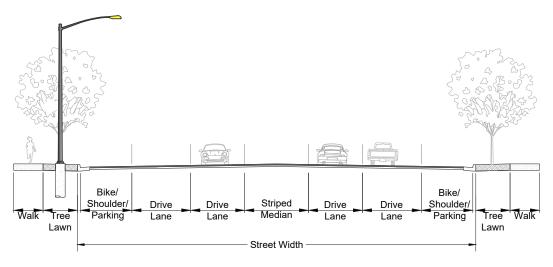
Typical Arterial with Street Lights at Intersections Only Cross Section
